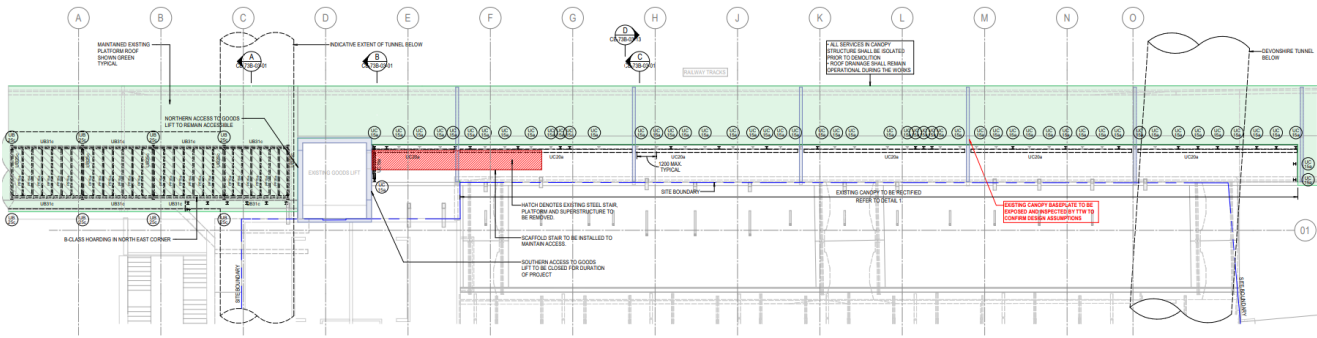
A-Class Hoarding Plan – Platform 1 Central Station
